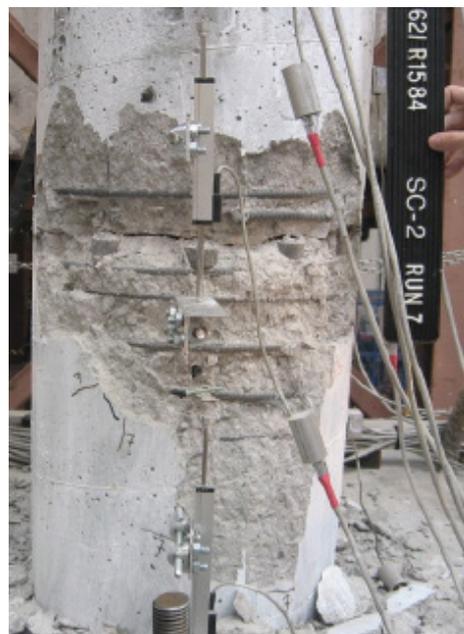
SC-2 (conventional reinforced concrete—the benchmark)
